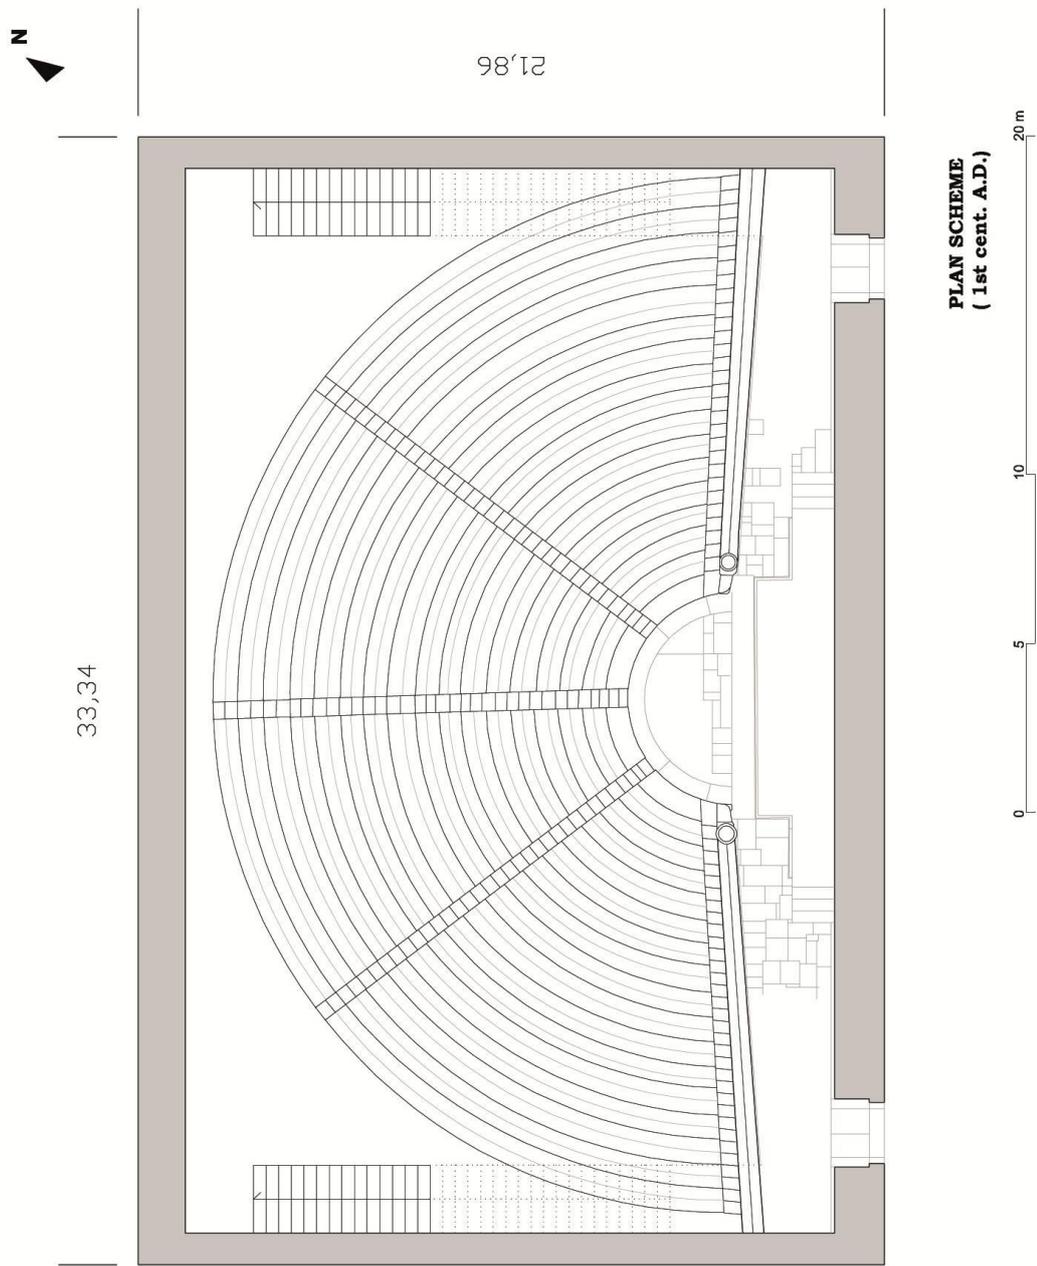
Plan scheme of Bouleuterion dated to 1<sup>st</sup> cent. A.D.
